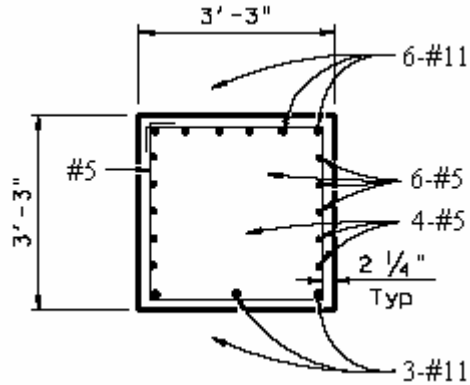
Lake Ray Hubbard Bridge Project – Bent Cap Reinforcement at Connection Zones
